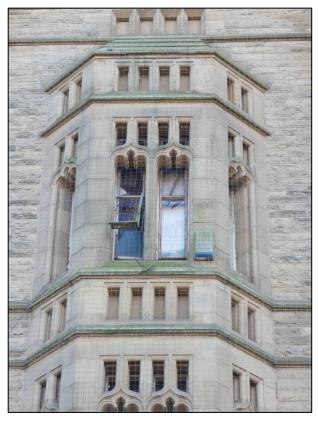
Second floor oriel window to central tower (2F1), looking S (photo 1/753).
